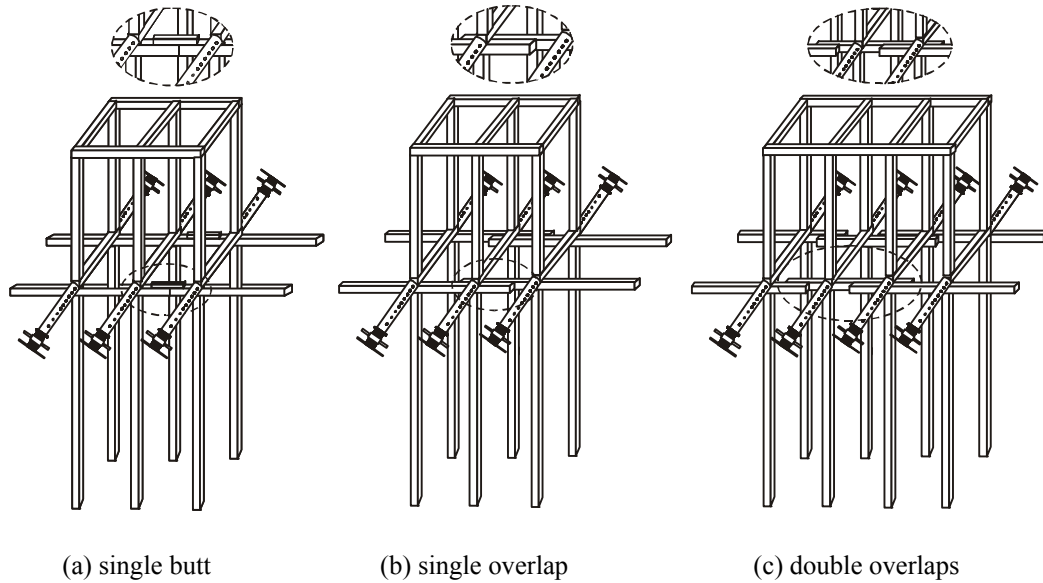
Arrangements of Double-layer Shoring Systems with Varied Connection Forms for Horizontal Stringers
